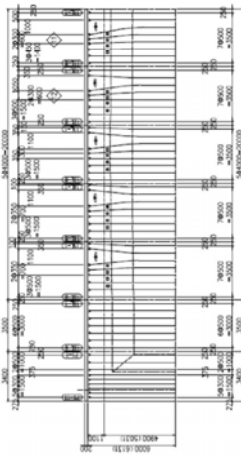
Cross-section wise Cable Arrangement of the Top Slab (Section near A2)
